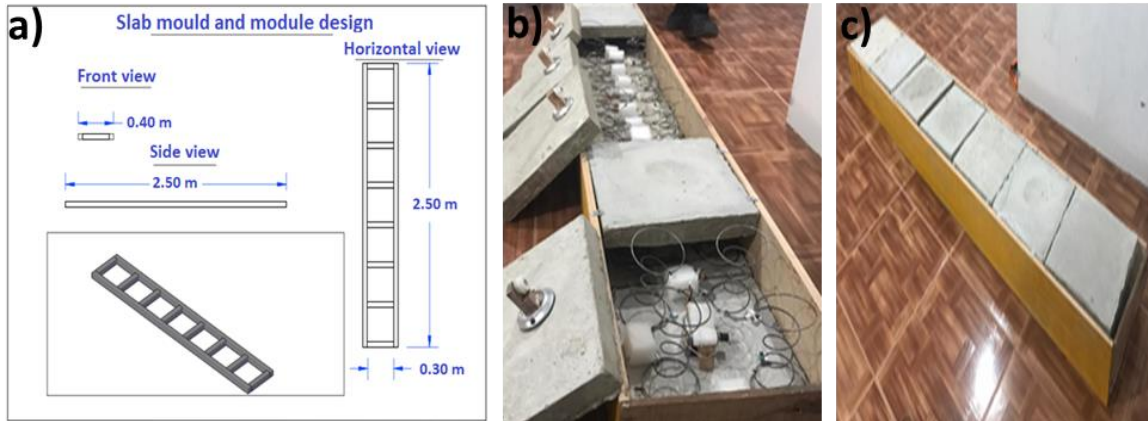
Slab production: a) Slab mould and module design; b) Assembly of the mechanical part into the slabs; c) Module with the slabs connected horizontally
